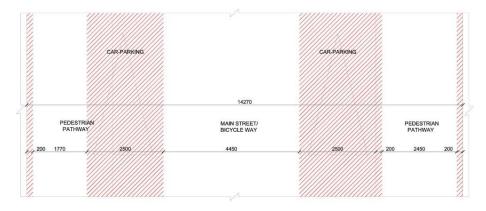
Street width and buffer spaces (in mm) for Gateway 12 in the area surrounding Offenbach am Main Hauptbahnhof
